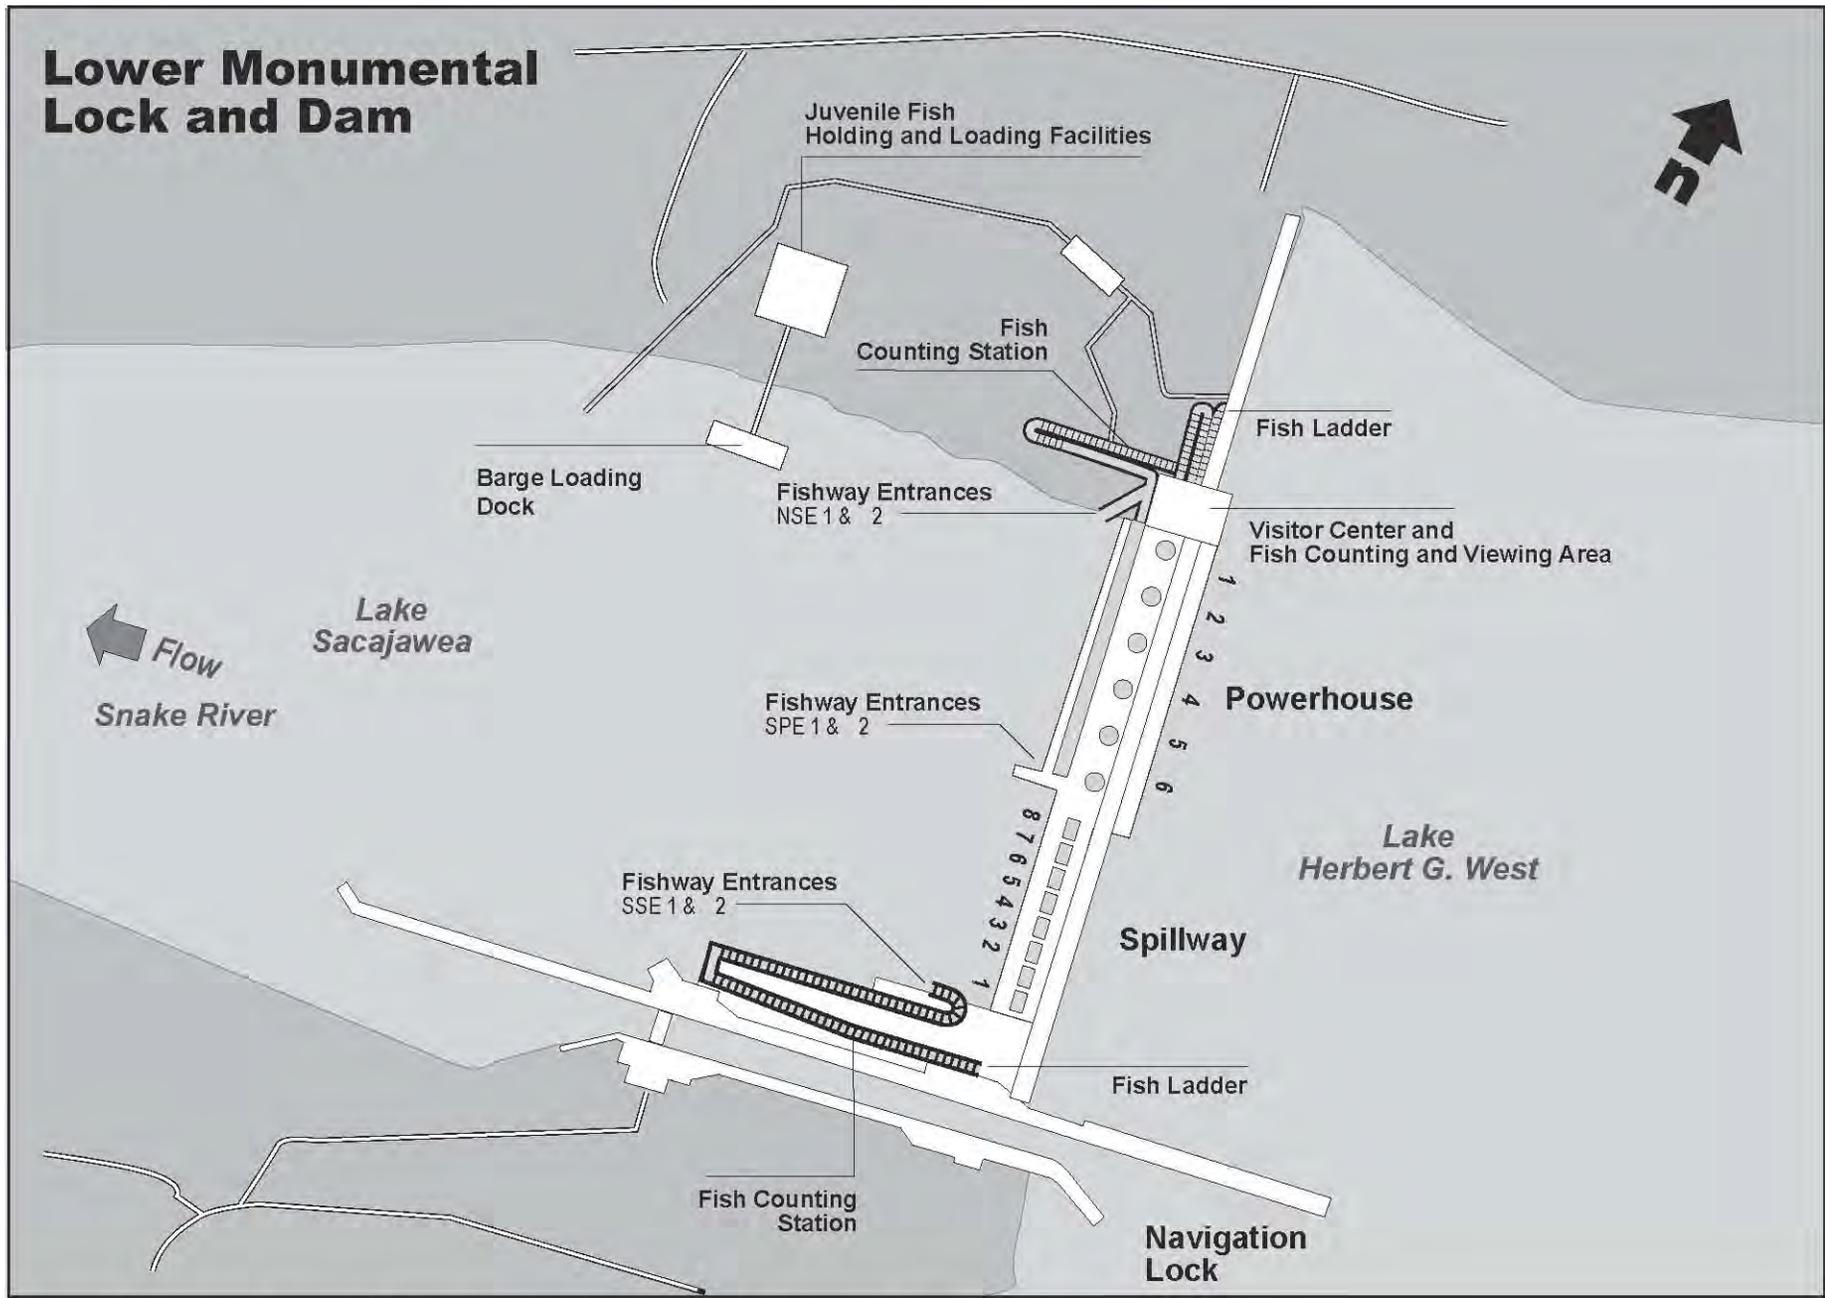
Lower Monumental Lock and Dam General Site Plan
